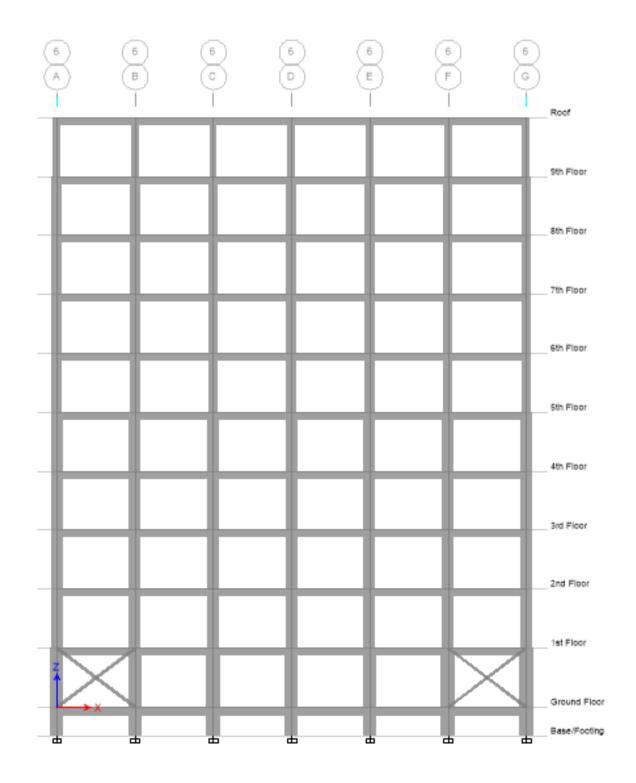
Steel bracing arrangement in the modeled G+9 frame
